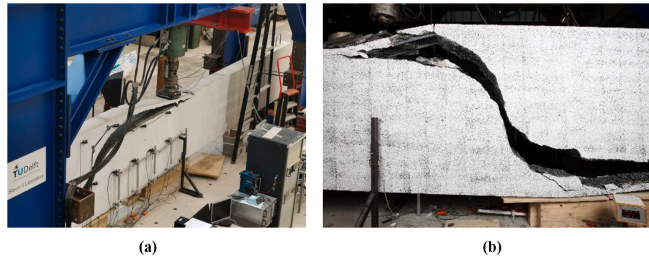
Photos of (a) the test set-up and (b) the typical crack pattern at failure [61].
